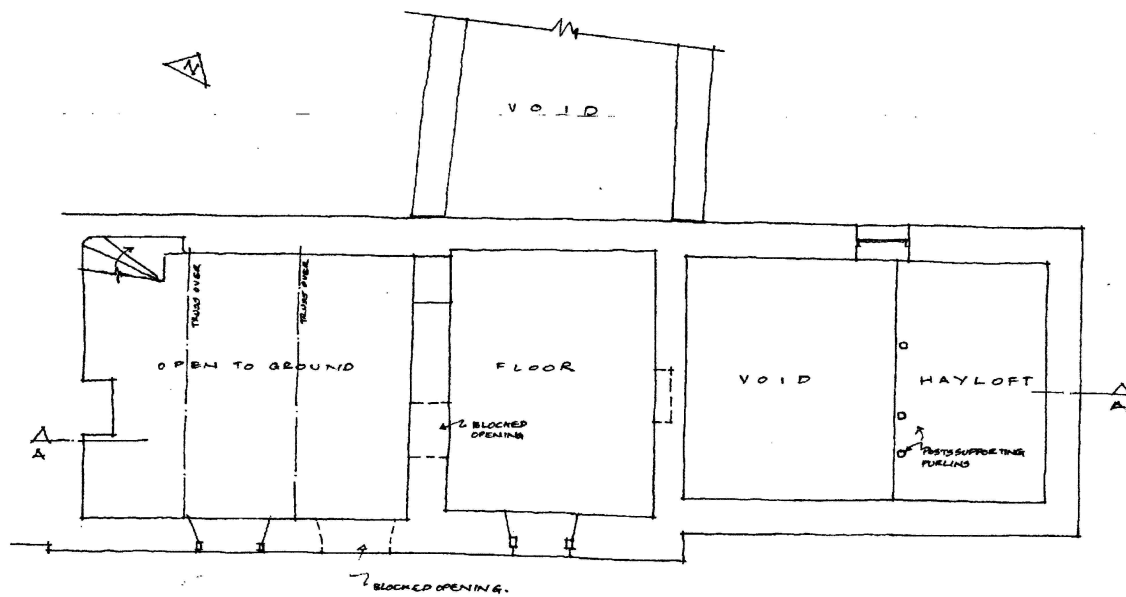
PAUL CROSBY'S GROUND PLAN AND ELEVATIONS (2007)
